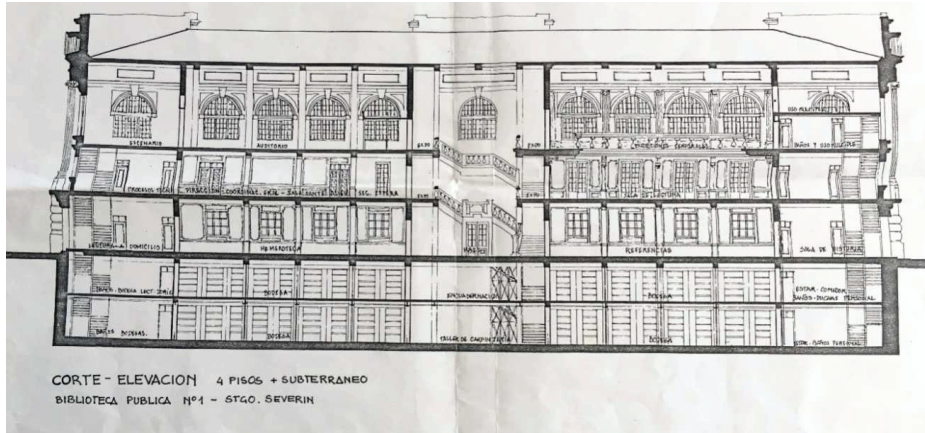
Section cut and elevation plane with underground project. Source: Archive Santiago Severín Library.
